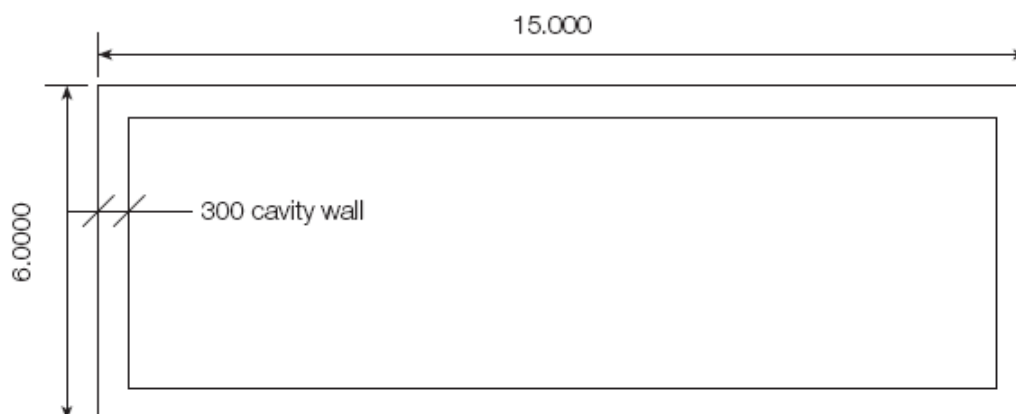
Plan of a rectangular building: Source: Hore, O’Kelly and Scully (2009 p.29)
